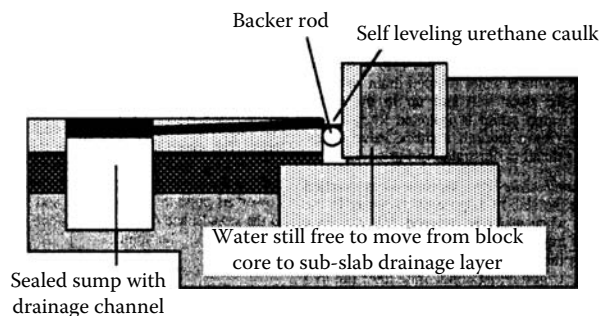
Sealing a French drain. (Adapted from U.S. EPA, *Radon-Resistant Construction Techniques for New Residential Construction—Technical Guidance*, EPA/625/2-91/032, U.S. Environmental Protection Agency, Washington, DC, February 1991.)
